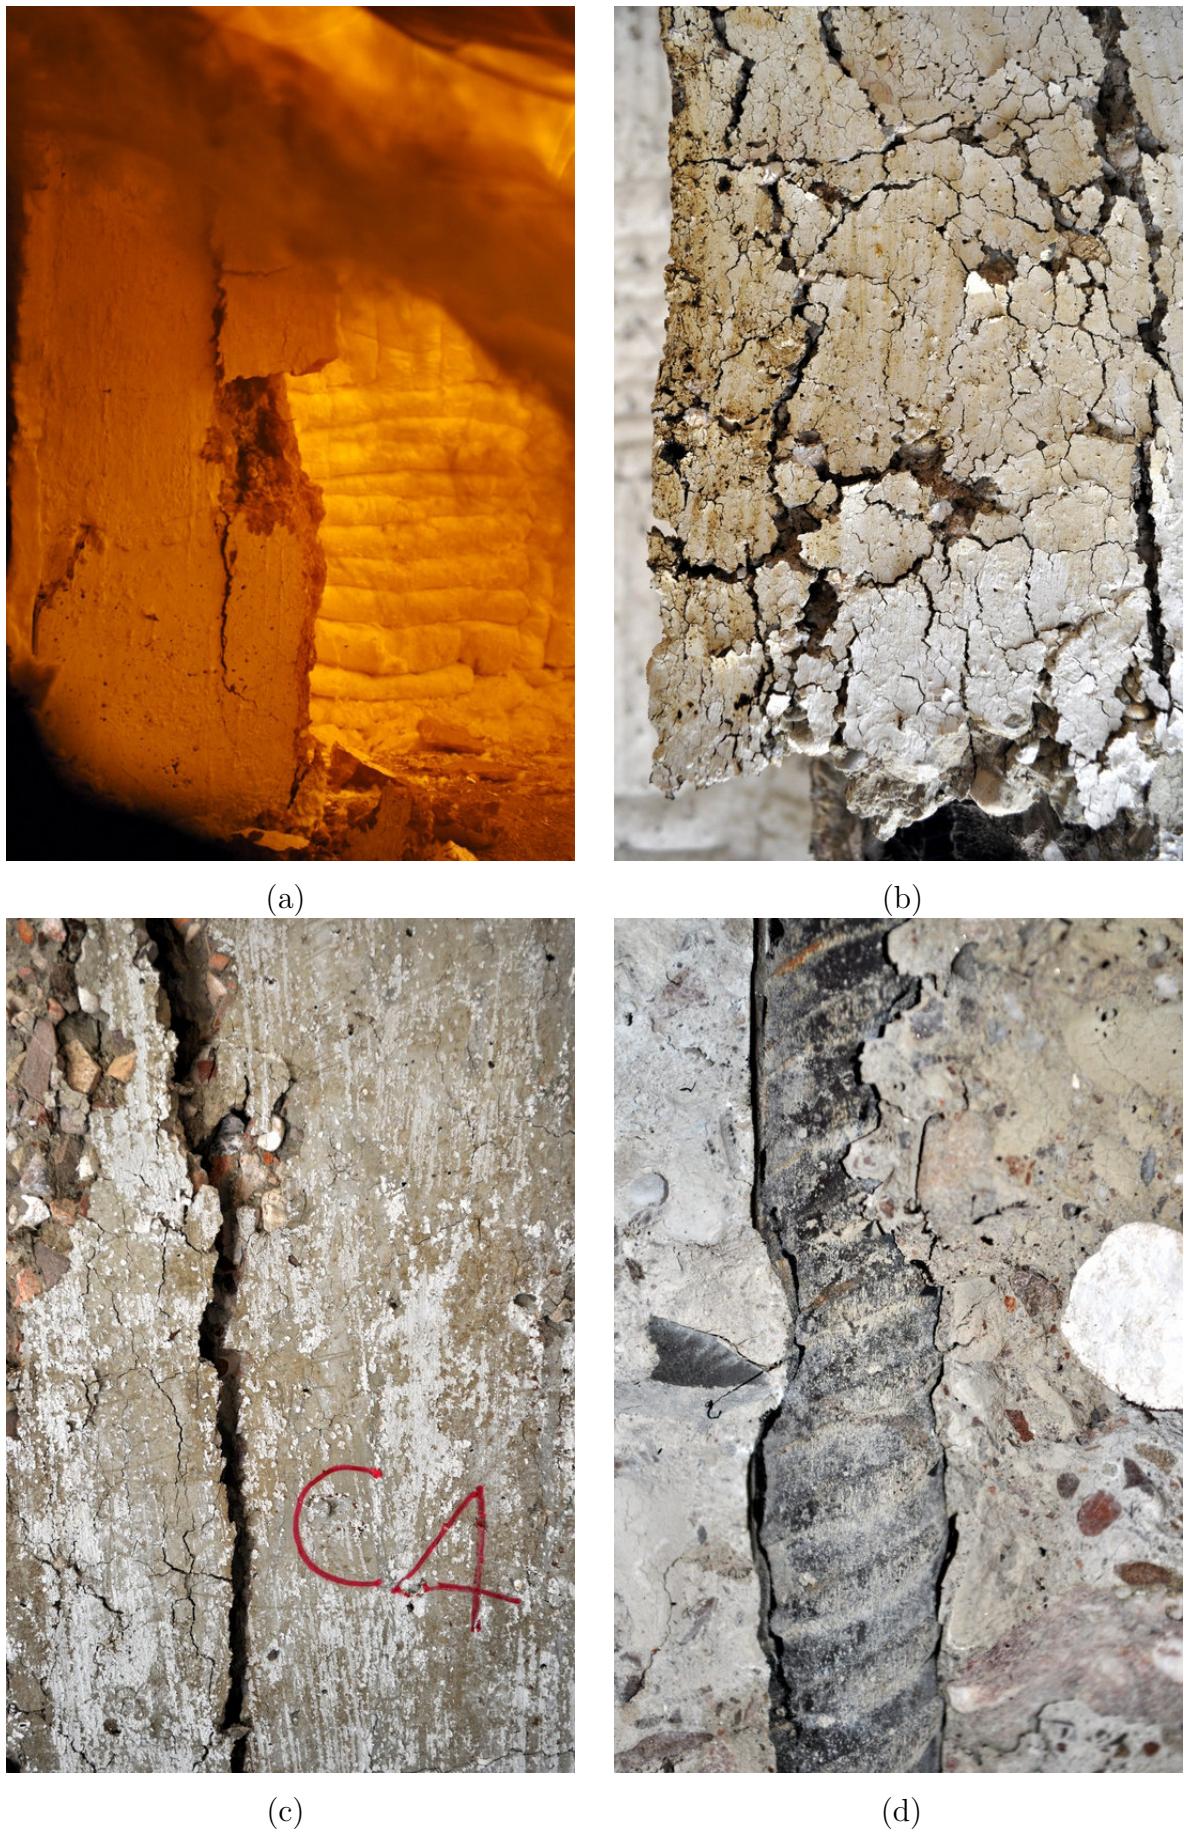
Structural damage in Fire (a) Spalling during fire (b) Surface microcracks (c) Spalling of cover concrete in cooling regime (d) Debonding of reinforcement
